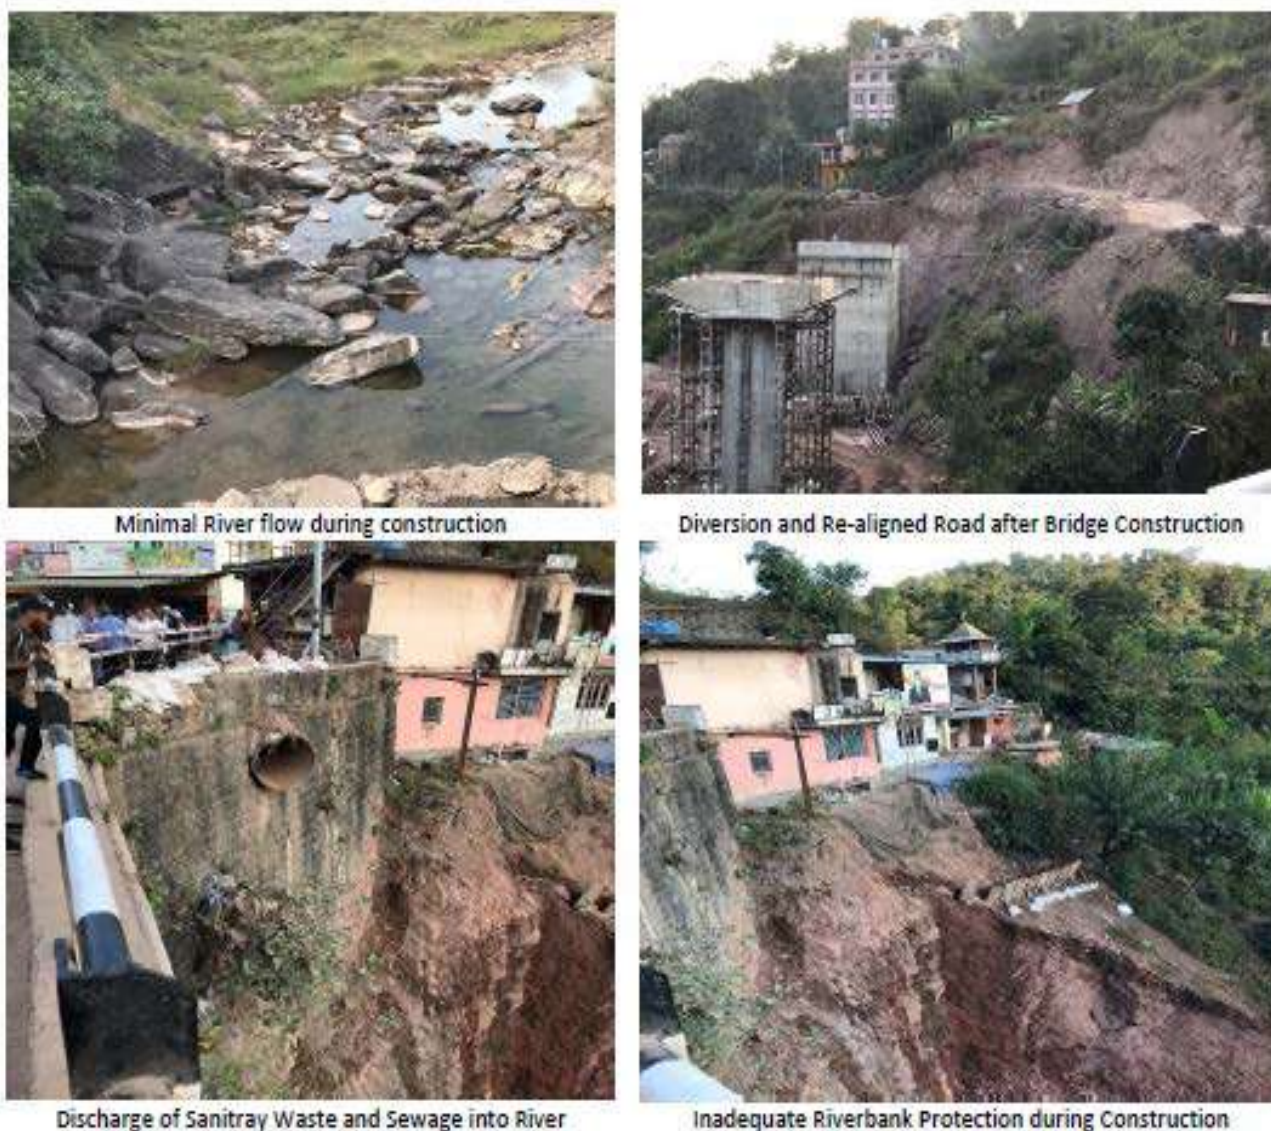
Photographs of sewage discharge and damaged riverbanks at Associated Facilities
